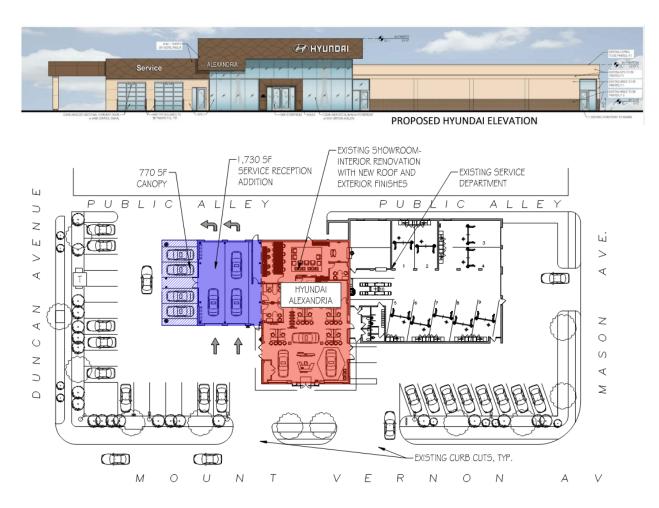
1707-1711 Mount Vernon Avenue proposed elevation and site plan changes noted in color
